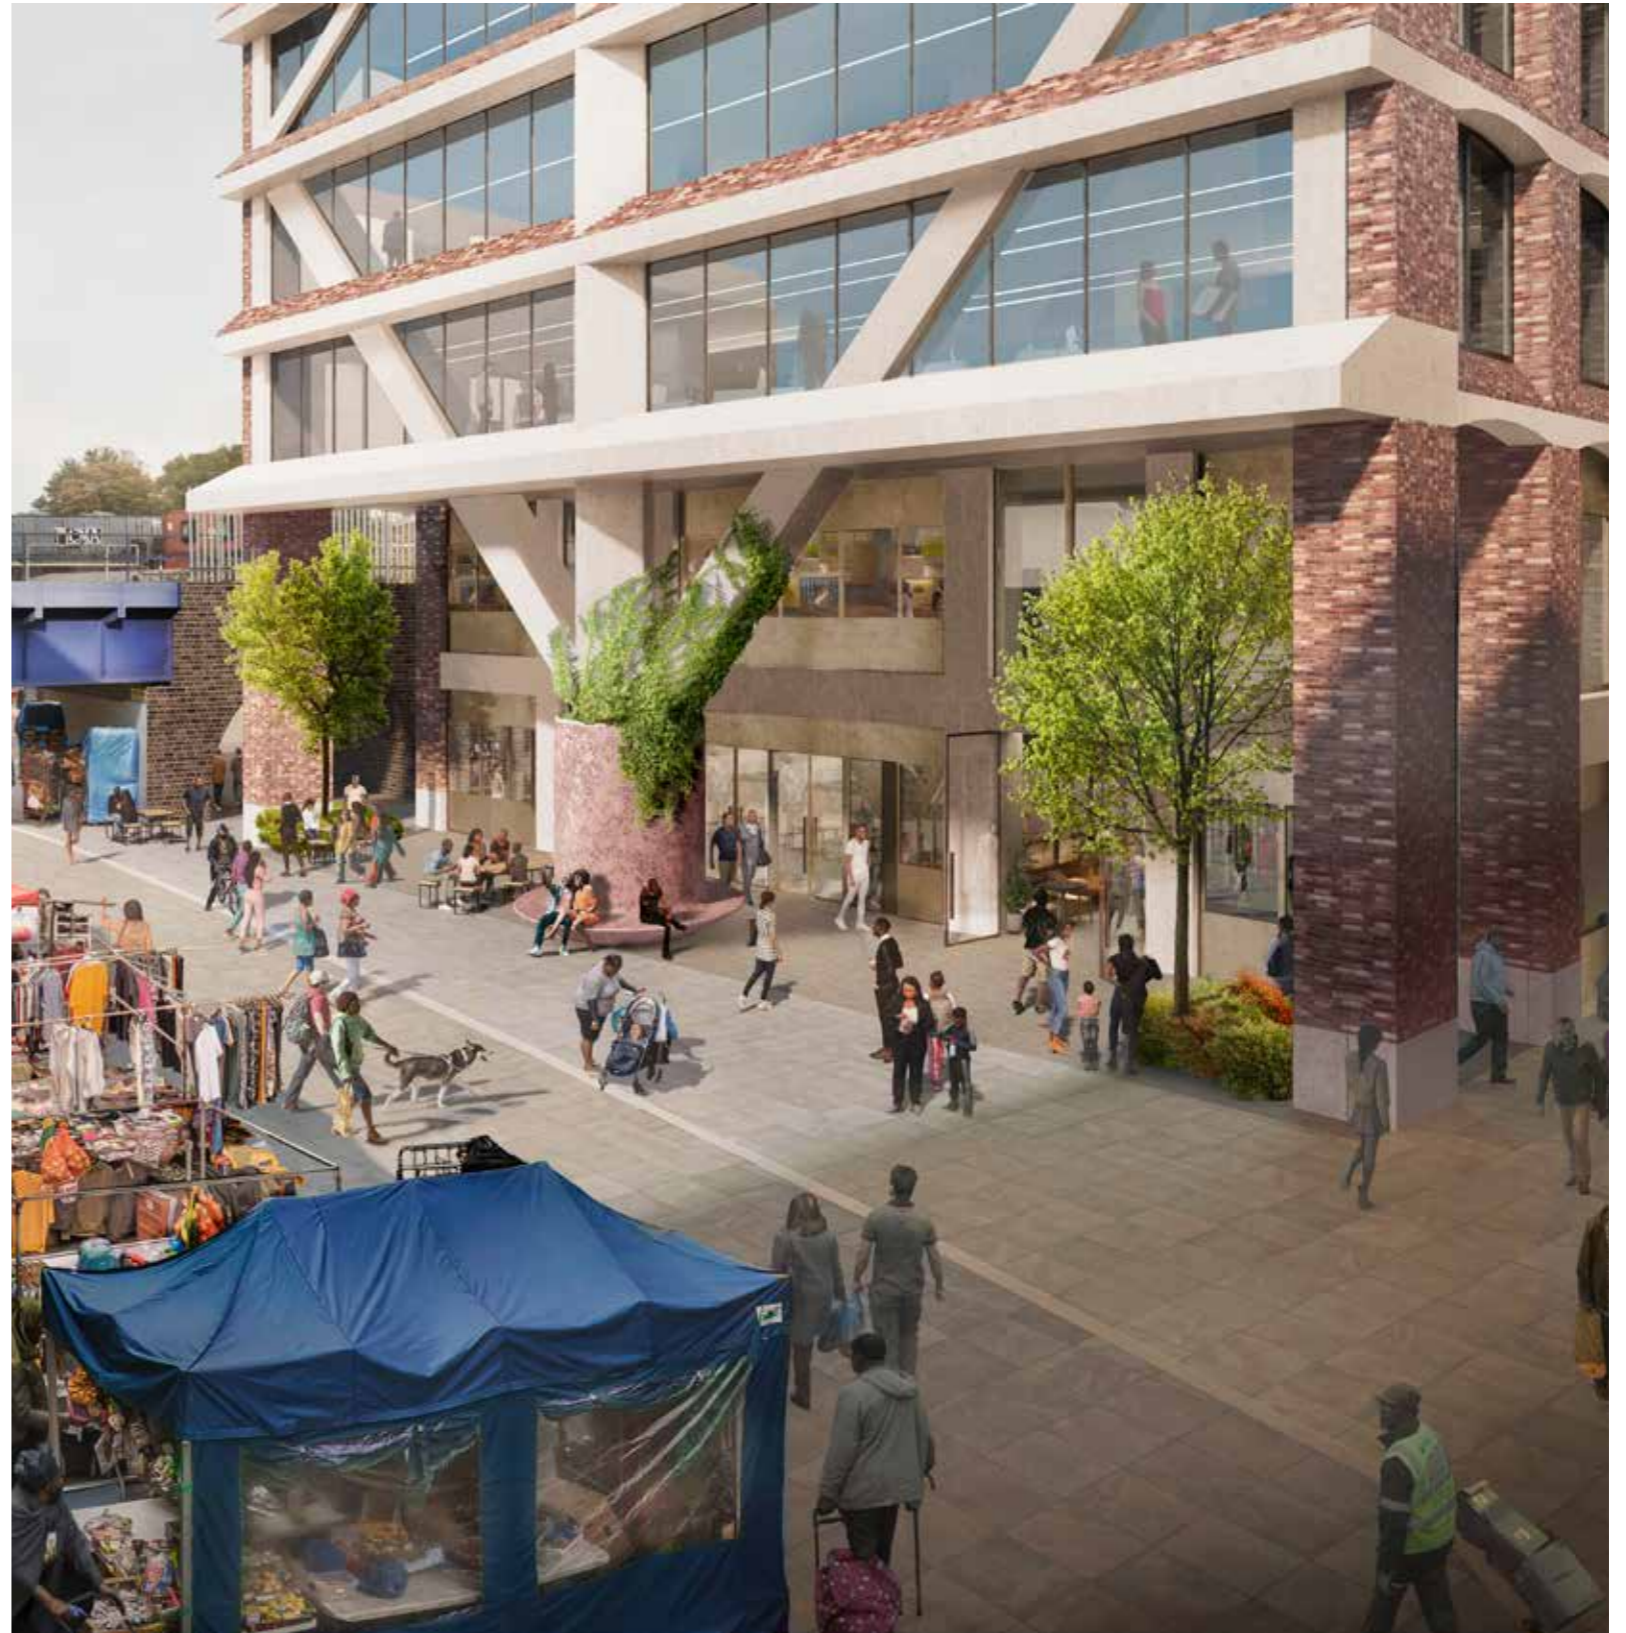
September 2020 Planning Addendum south-west facade bottom part illustrative close up view
